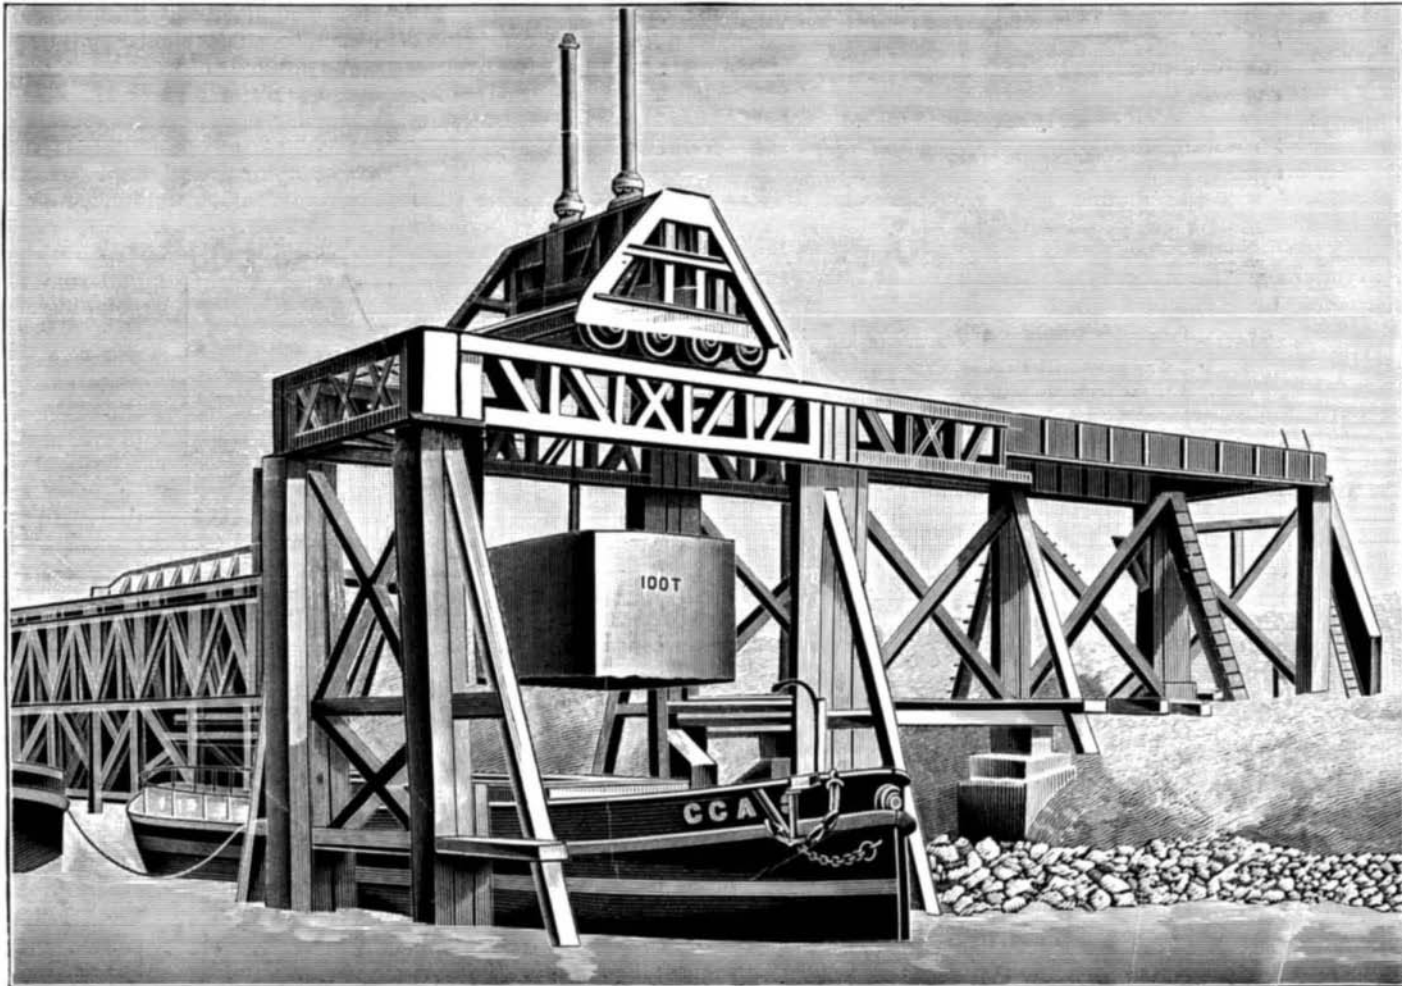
WORK AT THE PORT OF BILBAO—FRAMEWORK AND APPARATUS FOR LIFTING BLOCKS OF BETON AND LOADING THEM ON A BARGE.
